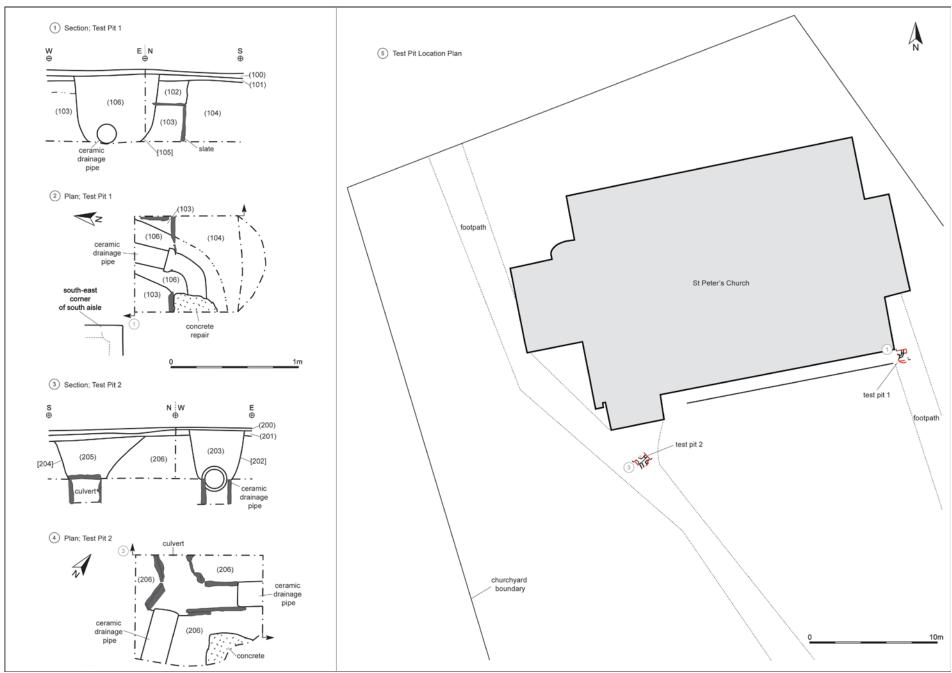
Site drawings; test pit sections and plans; test pit location plan. Section drawing numbers (1 & 3) correspond to the grey-scale numbers on the plans.
